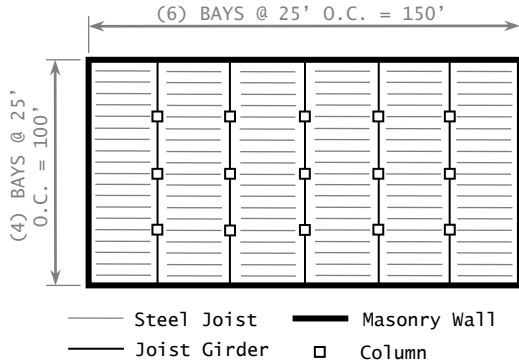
Plan view of a typical lightweight metal building. These typical buildings will provide the basis for a probabilistic examination of risks of snow-induced damage and failure in buildings.
